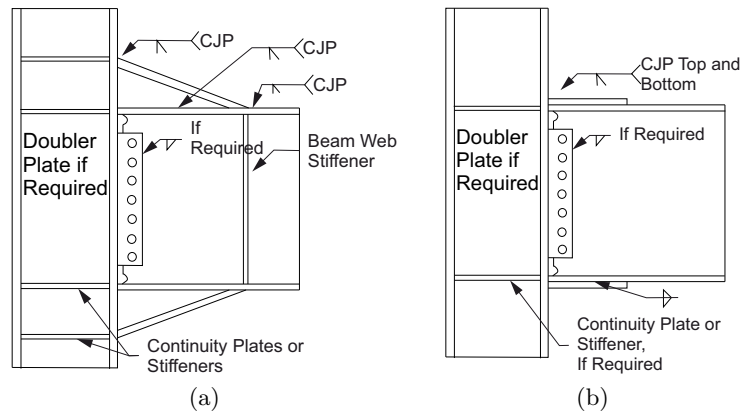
Figures to show two common methods of reinforcing the connection (a) Haunched connection (b) Cover plate connection
